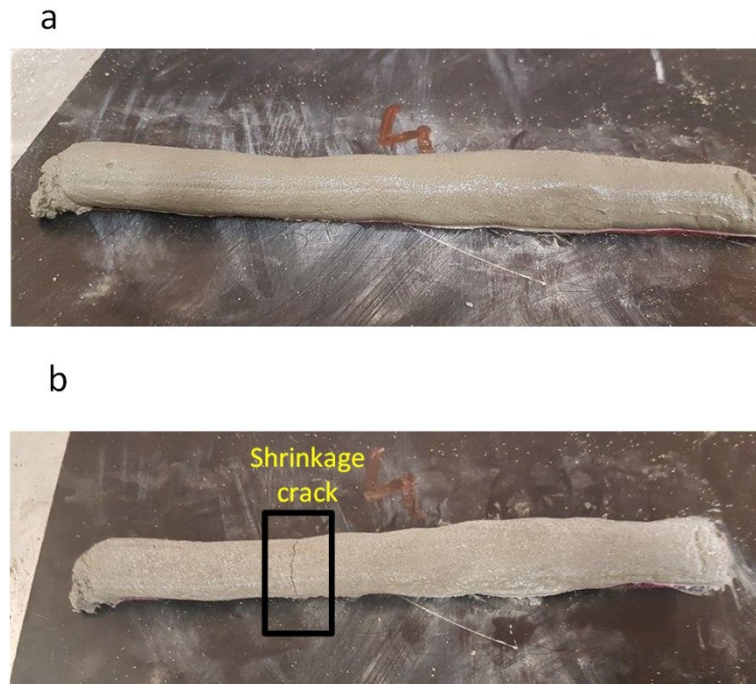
37: (a) The printed part immediately after printing; (b) The printed part after one-day drying.
